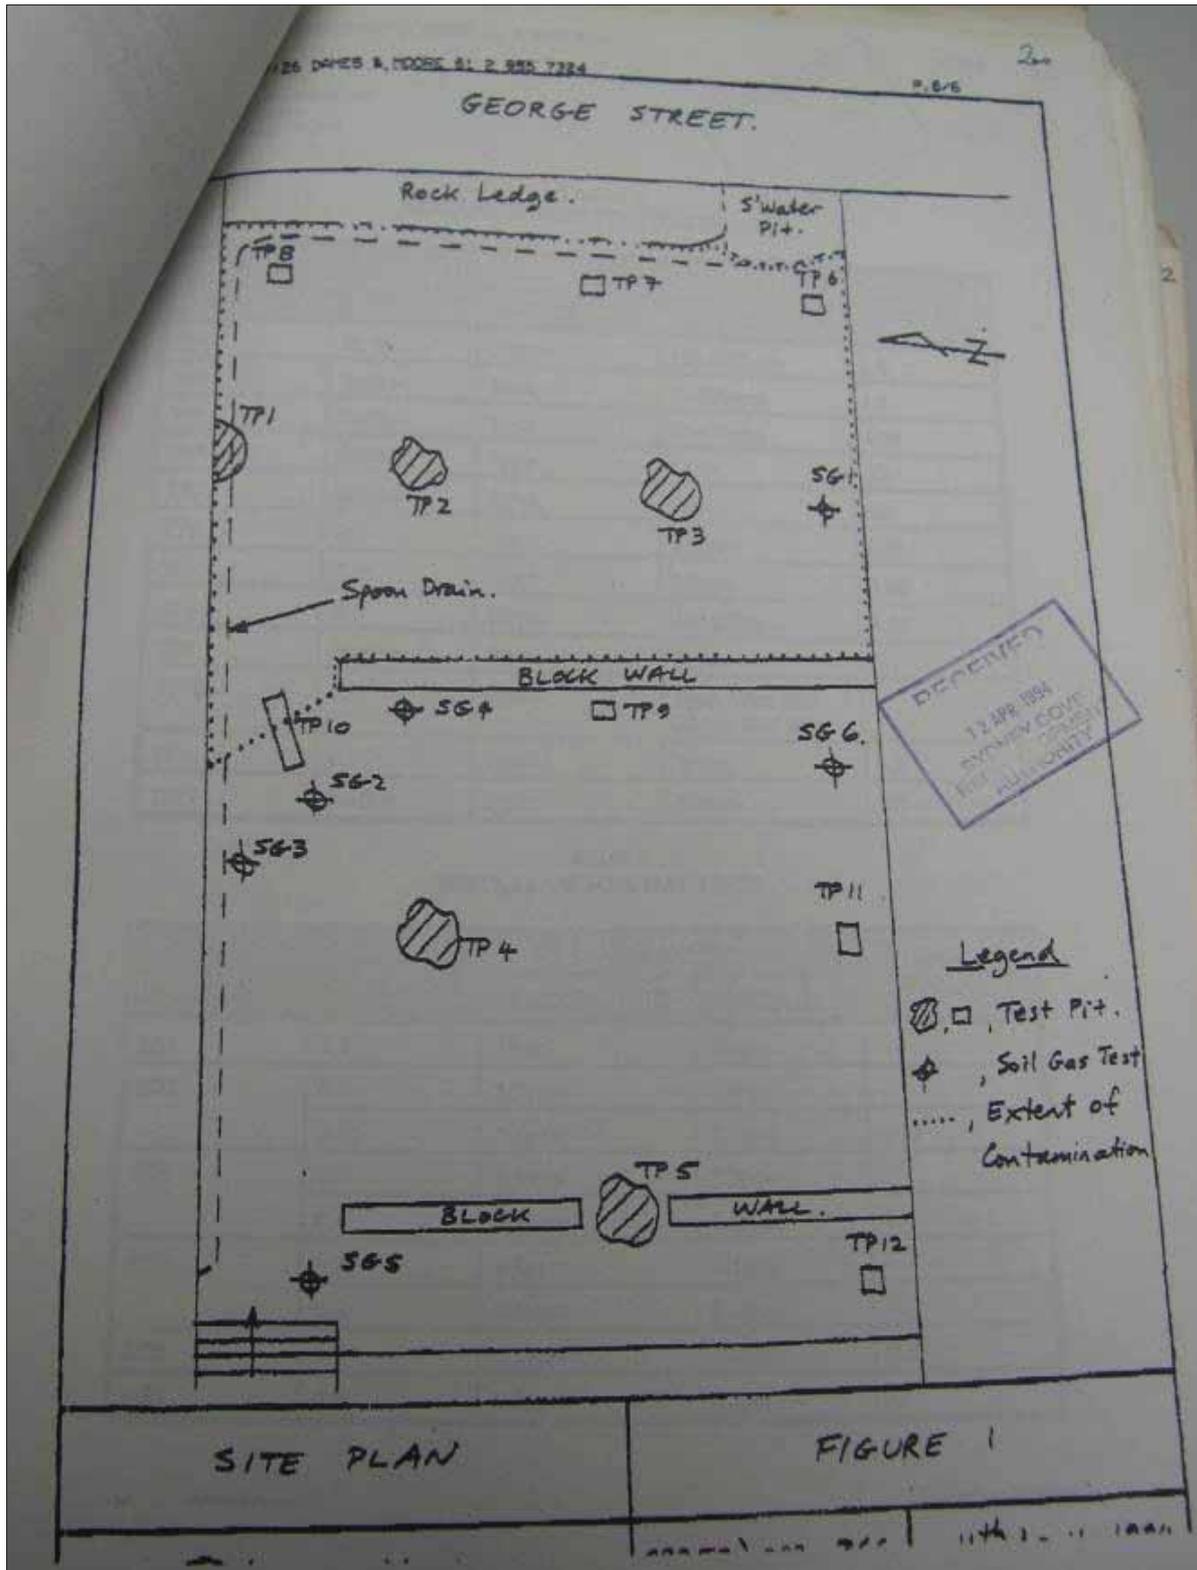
A 1991 site plan of the cellar, which shows the original or early foundations and dishdrain along with the pits for soil gas contamination tests, carried out due to the neighbouring service station. The Authority's records show that over 15 tonnes of earth were removed from the 73 George Street cellar due to petrol contamination.
